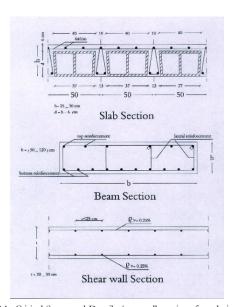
A: Critical Structural Details (e.g. wall section, foundations, roof-wall connections, etc.)
